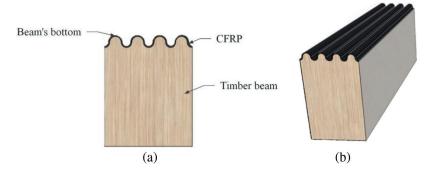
Corrugated beam with FRP sheet reinforcement [46]
